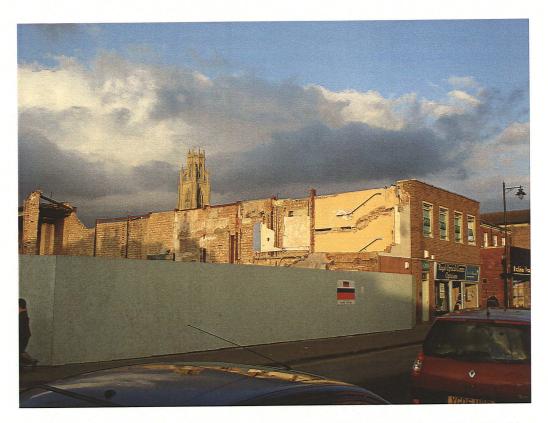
Corner of Bond Street with West Street (no. 49 West Street demolished) looking north-east
